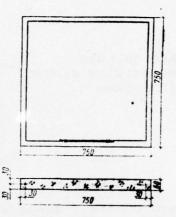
Flat, rectangular sidewalk pavement, concrete slab
